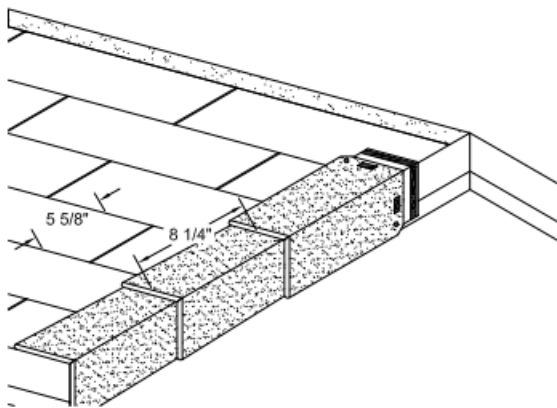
Installation of EZ-Ridge™ Shingles on Rake Edges of the Roof
